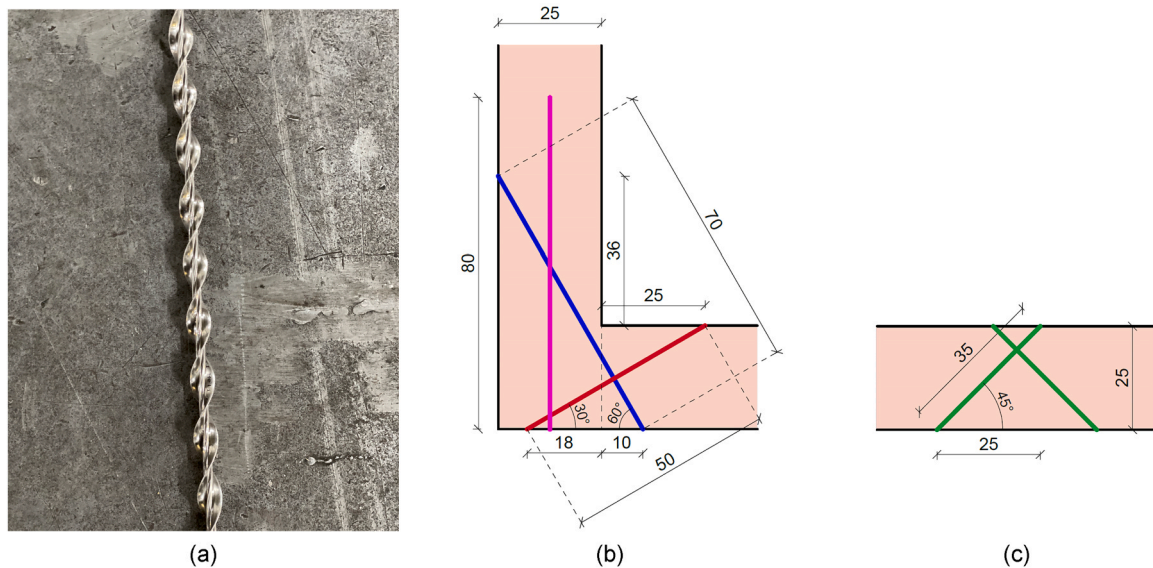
Twisted bar (a), installation lay-out at the corner (b) and on the front wall for the crack stitching (c) (measures in cm).
